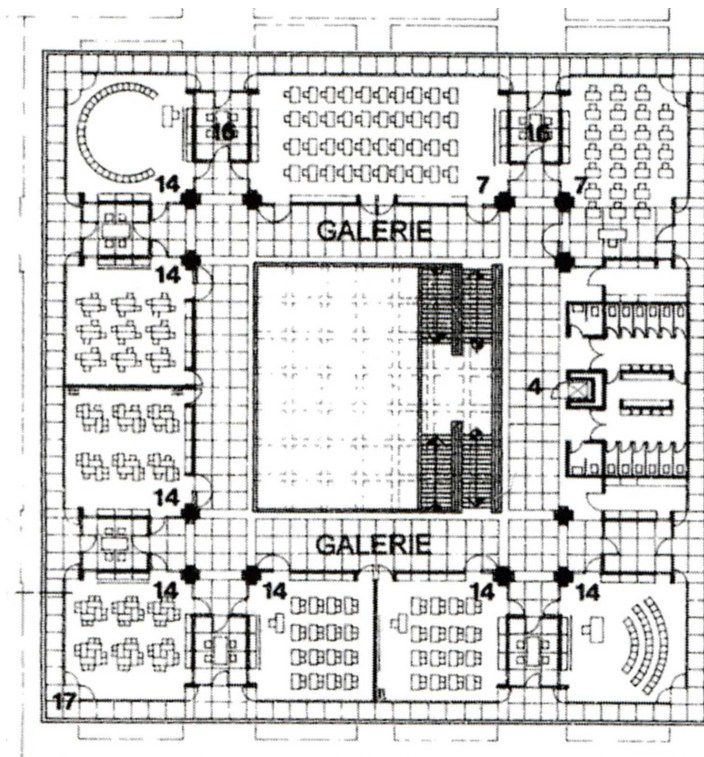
Floor plan *Hauptschule* Weiz with adjoining classroom sharing group rooms. Source: Hufnagl archive.
